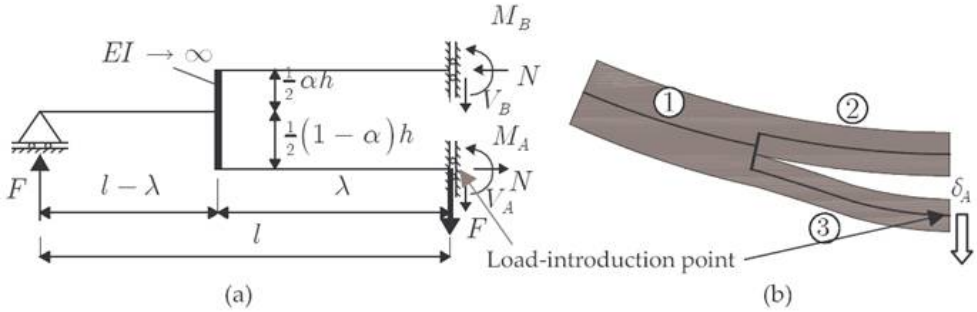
Modelling of structure; (a) statics of half the beam; (b) deformed shape and position of beam segments
